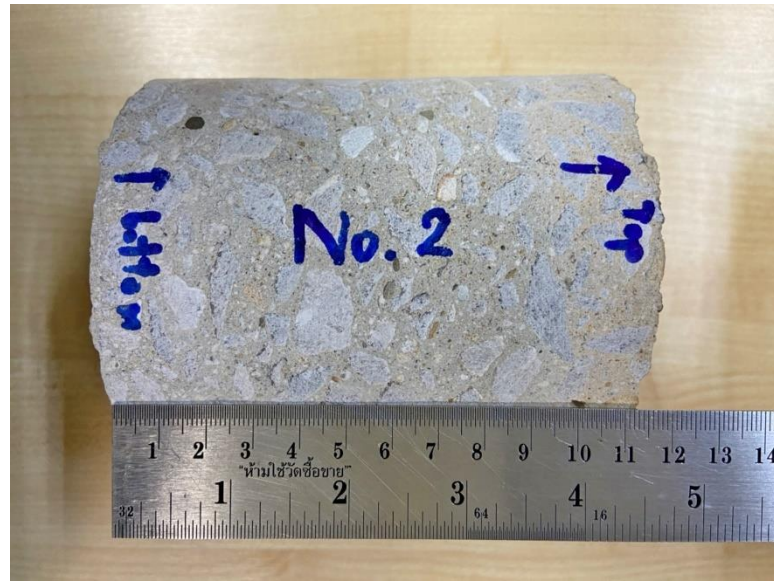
Concrete sample located on bridge span no.2 at gridline C/4
